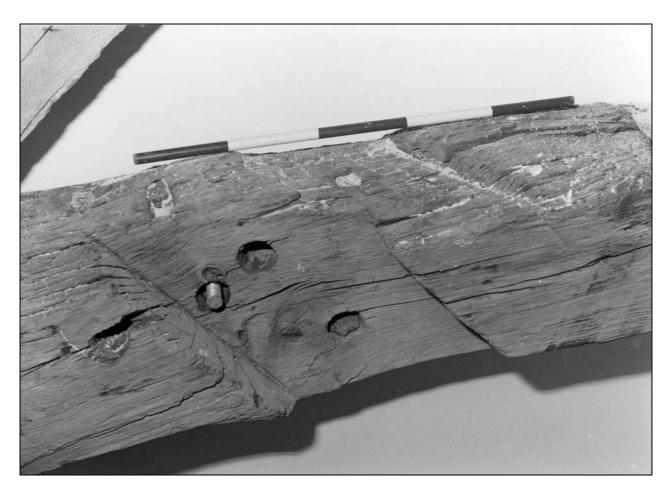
Detail of halving surviving from former cruck blade, tie beam of truss Y (film 1, frame 11)
